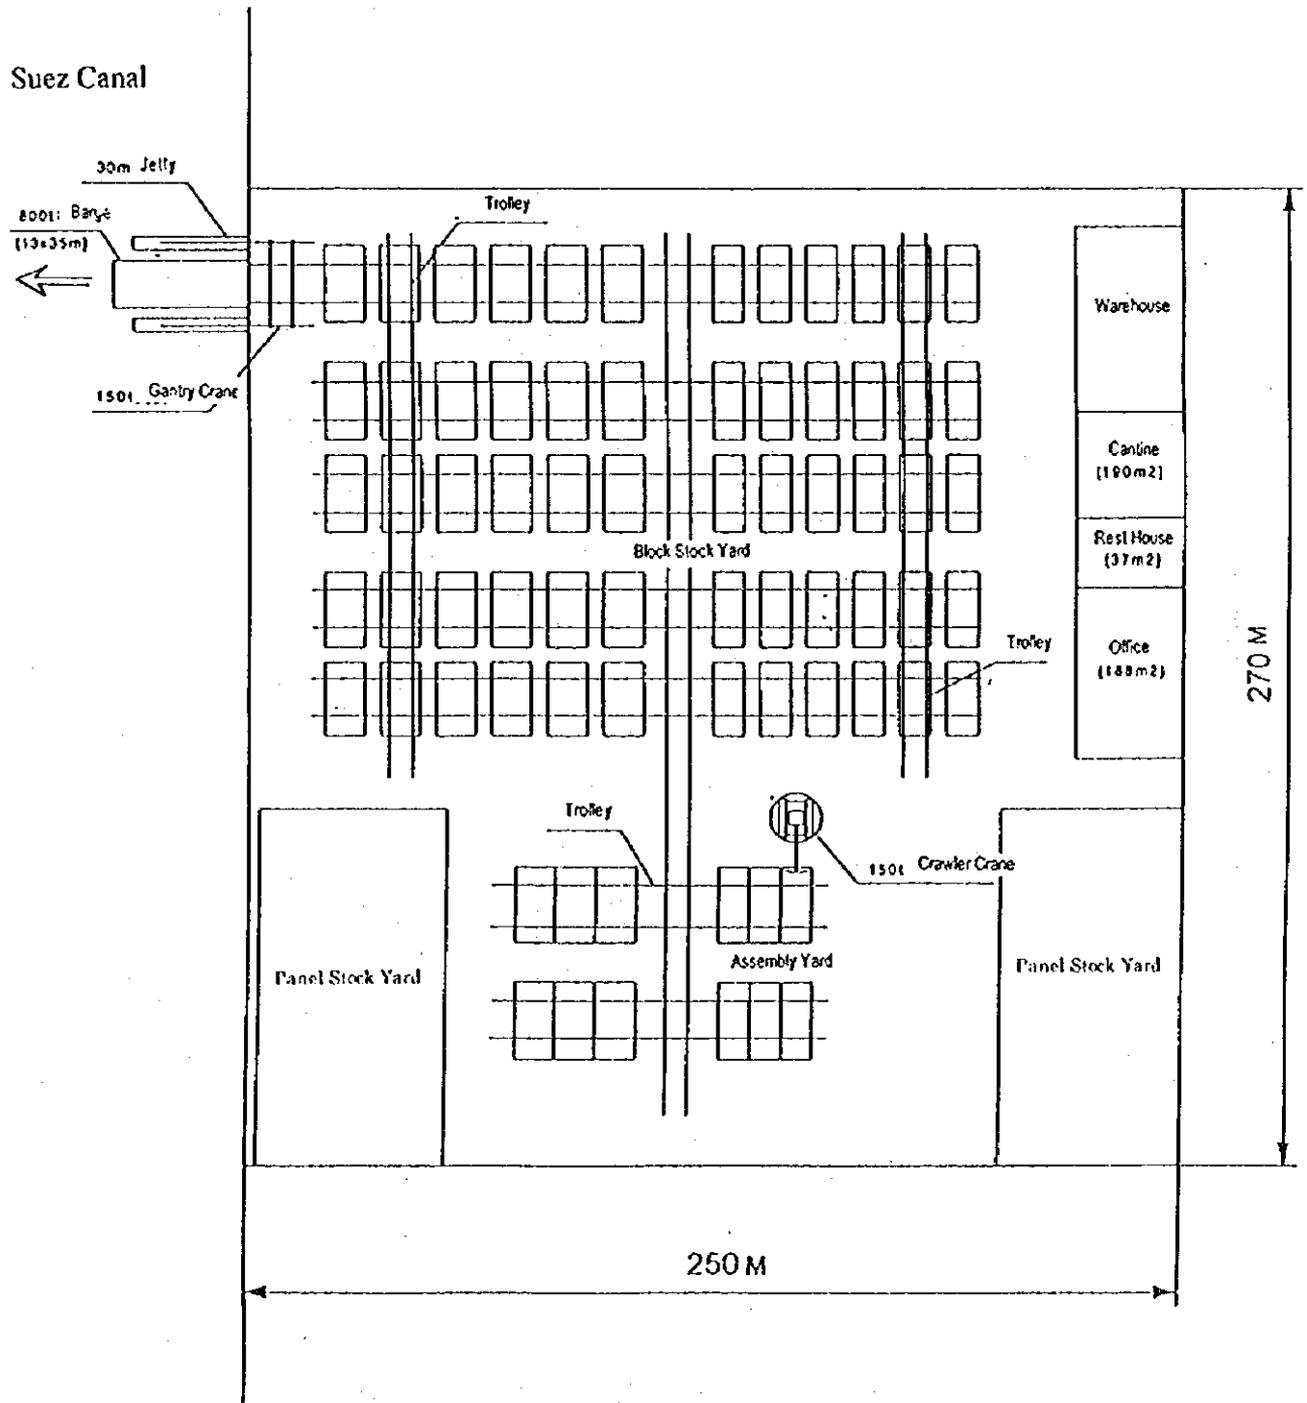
Steel Girder Assembly Yard (East Bank)
